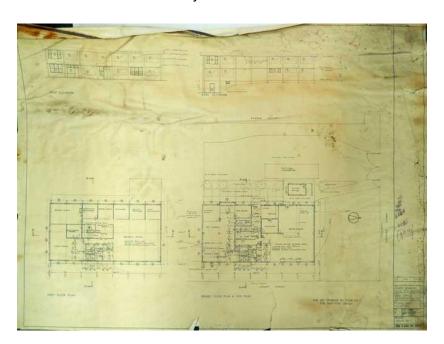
Drawings for construction of the Offices building 1963. (Source: Pacific Brands plan room)
